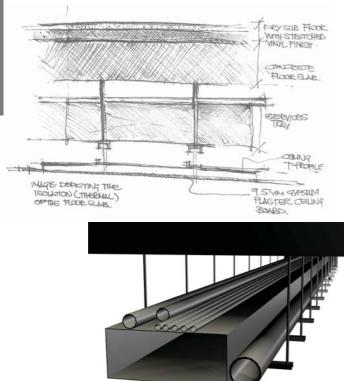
Exposing overhead service tray through removal of first floor ceiling
